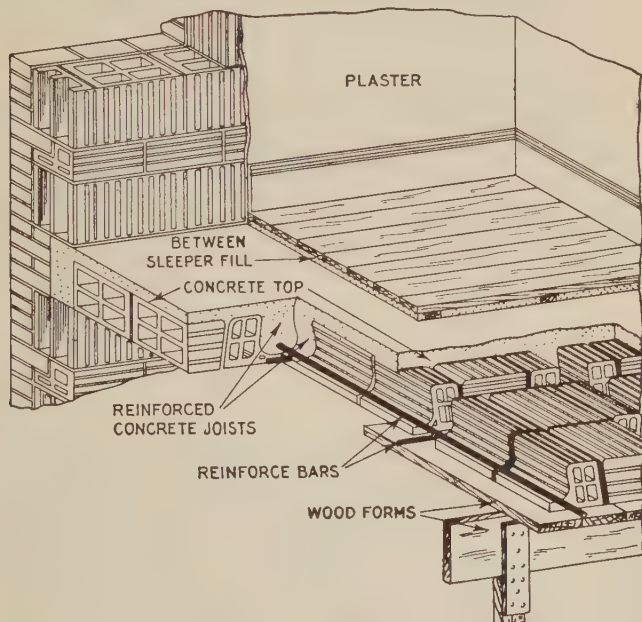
,076.—Two way tile joist slab. This construction combines the advantages of light dead weight and thinner slab.
